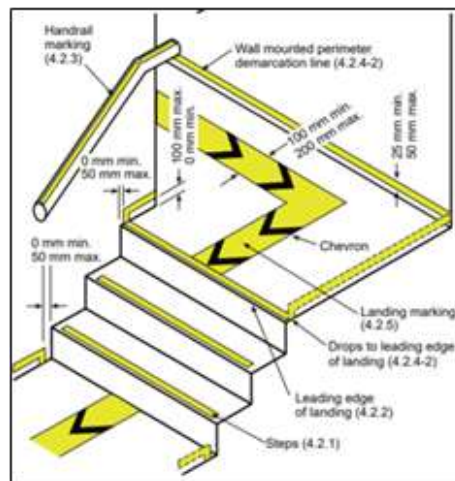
Photoluminescent stair landing exit path markings illuminate a ‘green’ glow that highlights the steps, rails, landings, doors and obstructions in a stairwell when the building lights or the emergency standby power fails. Source: NYC/Dept. of Buildings
